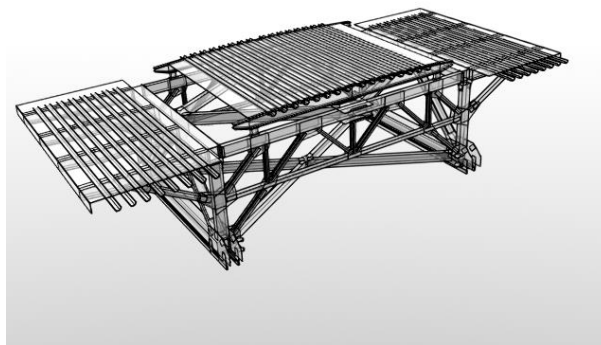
The truss section with the main orthotropic deck and two cantilever lanes
